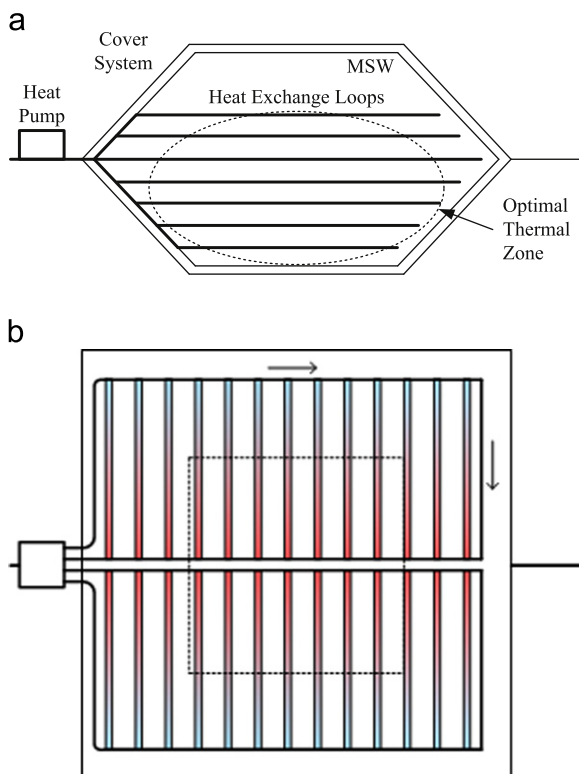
Horizontal “loop” geothermal heat exchanger configuration for closed landfills: (a) Elevation section of vertical configuration; (b) Plan view of vertical configuration.
